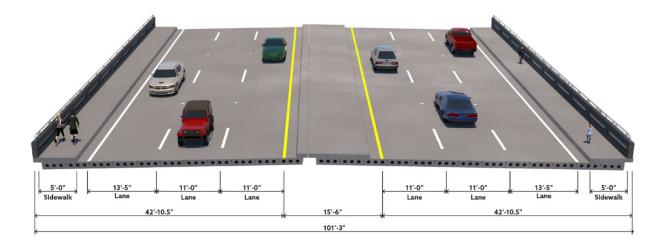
Western Pair Existing Bridge Configuration (Bridge ID Numbers 870083 and 870549)
